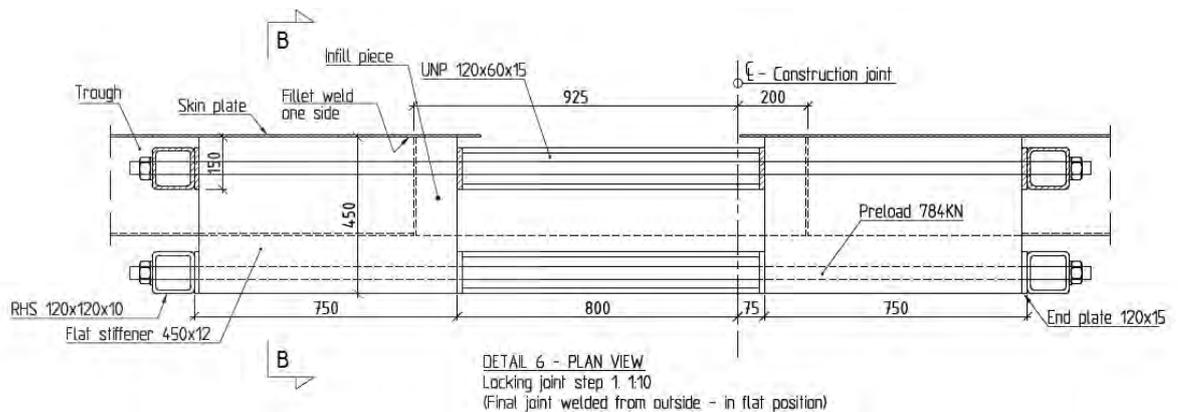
Locking joint for deck plate, construction joint 3 inclusive 800mm infill piece, longitudinal section
